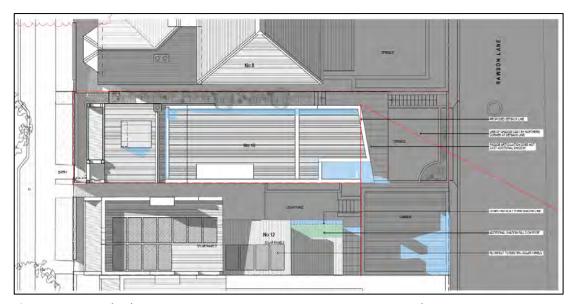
Overshadowing impacts at 3PM to 12 Rawson Avenue and Rawson Lane.
